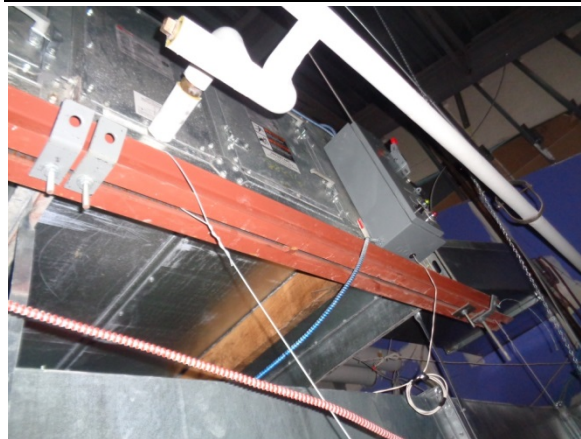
ABOVE-CEILING AIR HANDLING UNIT
